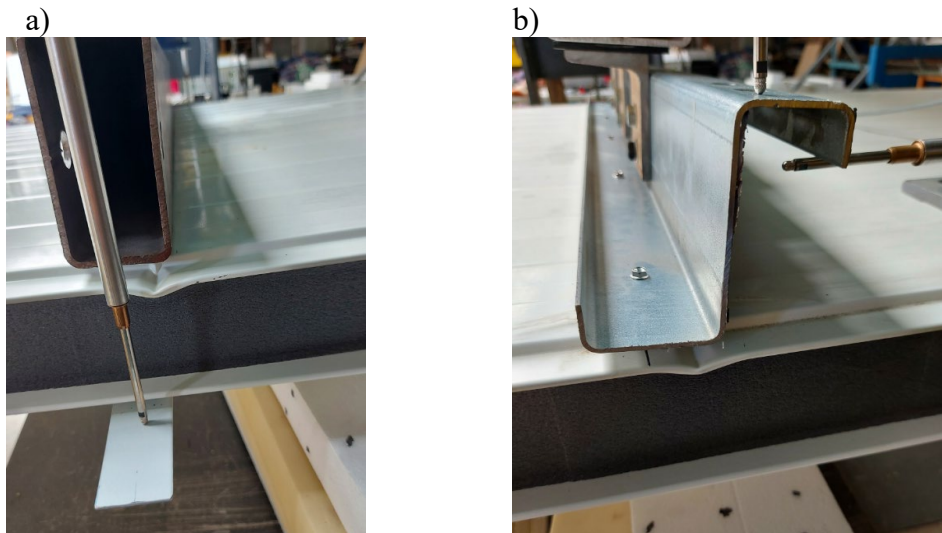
Local deformation under the purlin: a) box section, b) cold formed Z section
